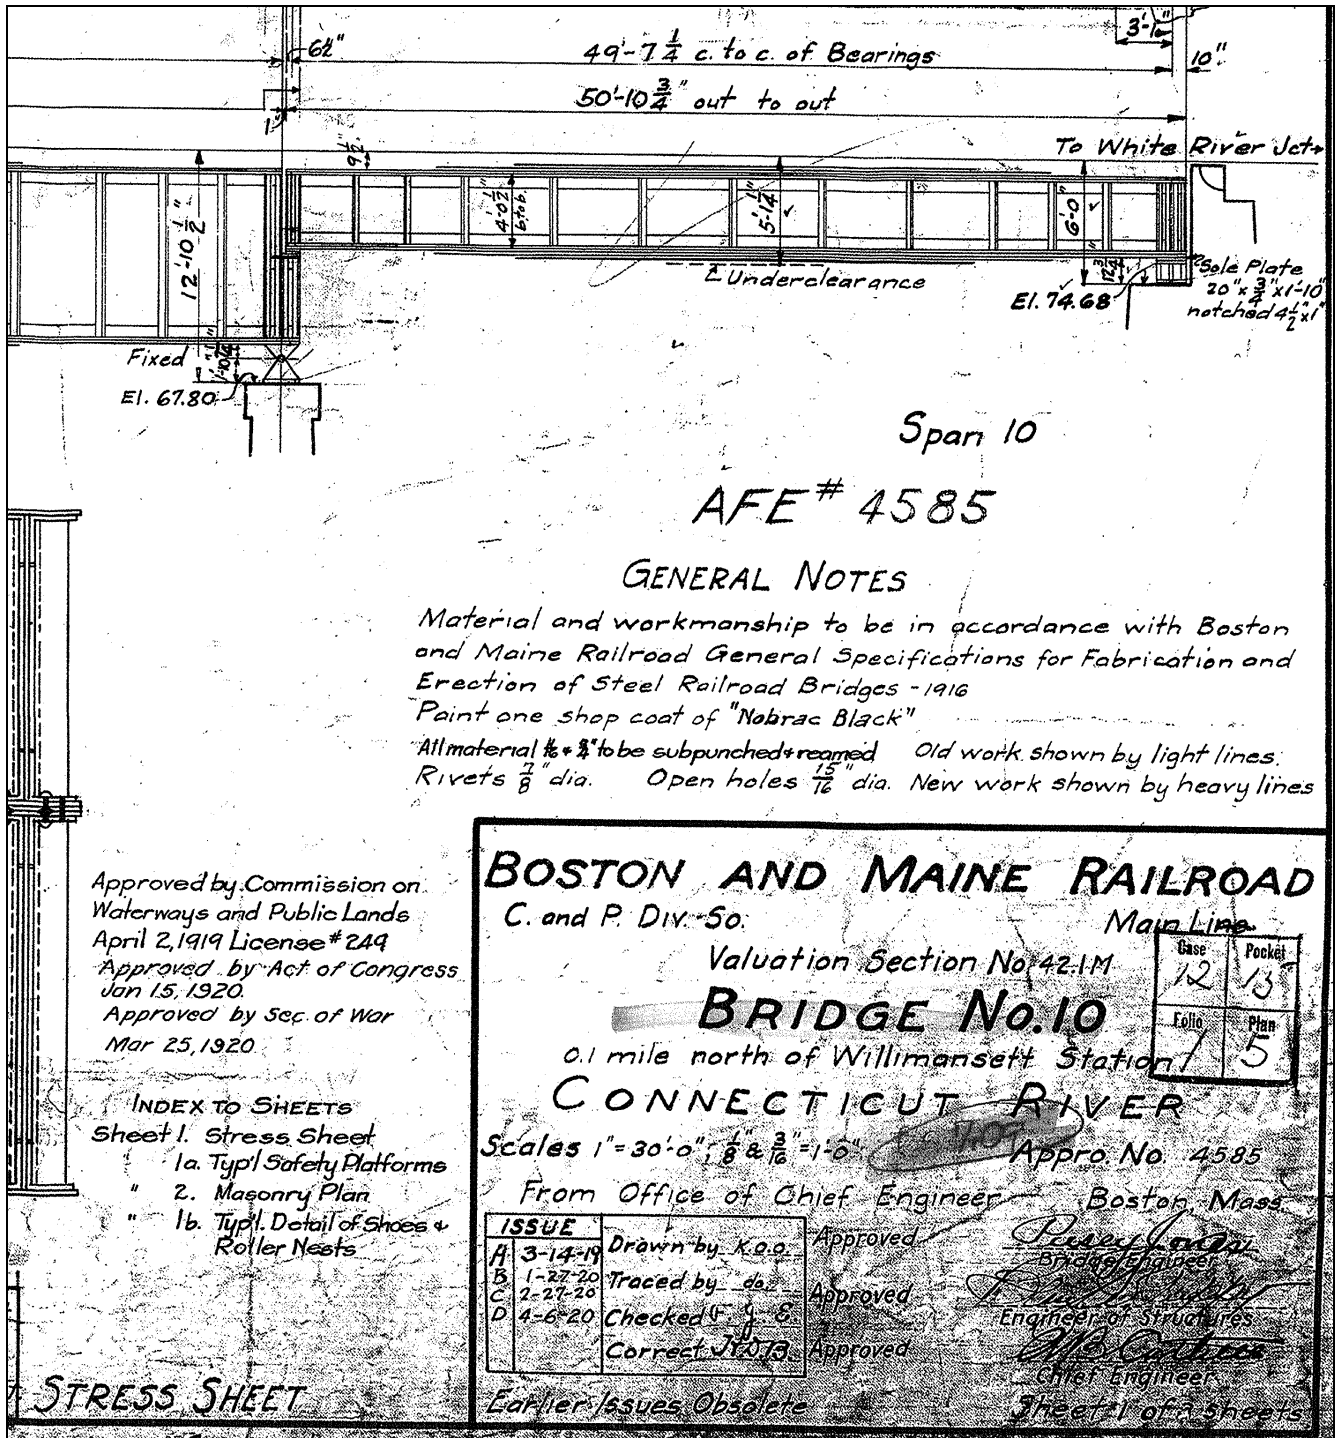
Portion of original plan sheet showing title block, general notes, and elevation of Span 10. (source: Massachusetts Bay Transportation Authority files).
